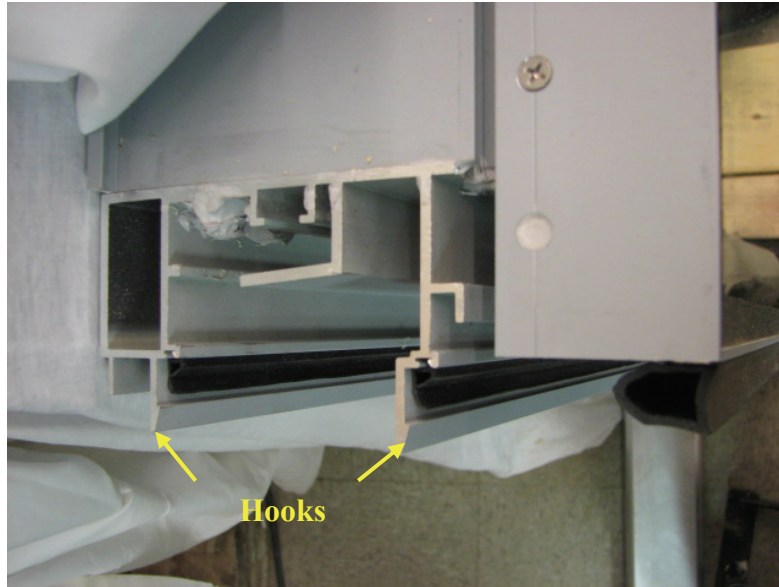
Attachment of the Bottom of the Specimen to the Facility.
